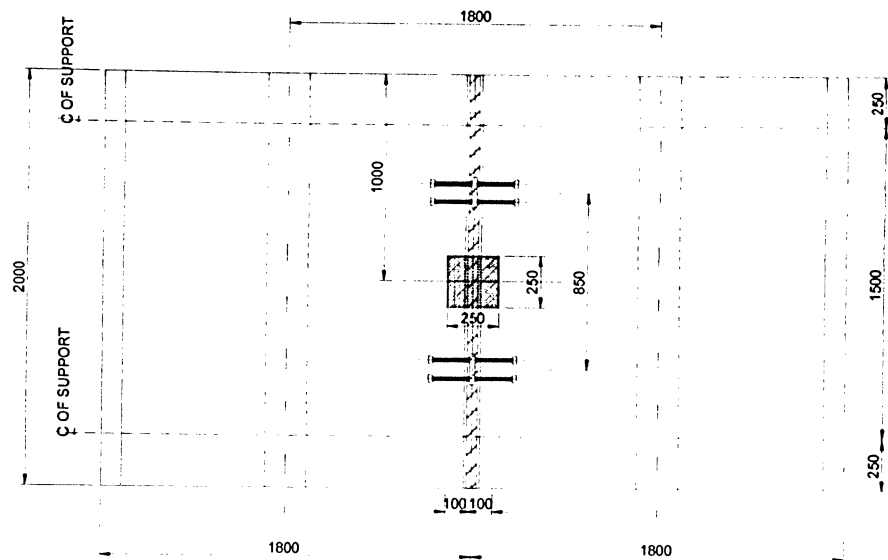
(b) Plan of Top Rebar Arrangement for Model M3
